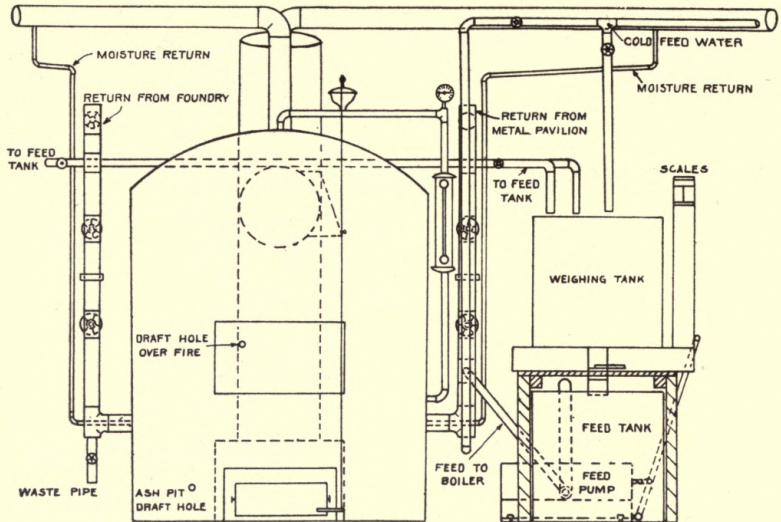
ELEVATION OF HOUSE-HEATING BOILER PLANT AT St. LOUIS, Mo.
